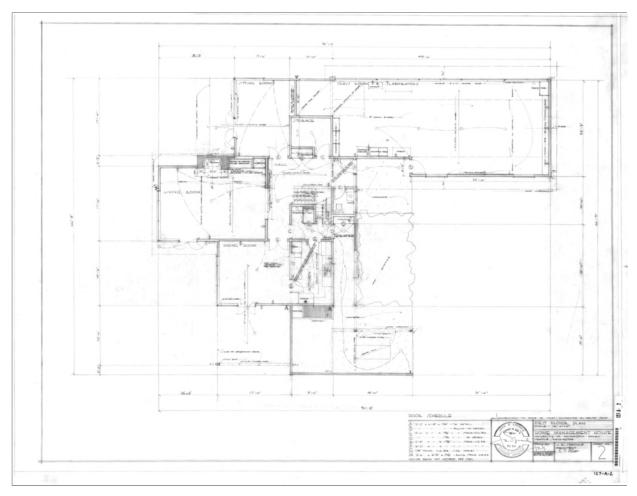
John R. Sproule's first floor plan for the Home Management House, courtesy of the UW Facilities Library.
